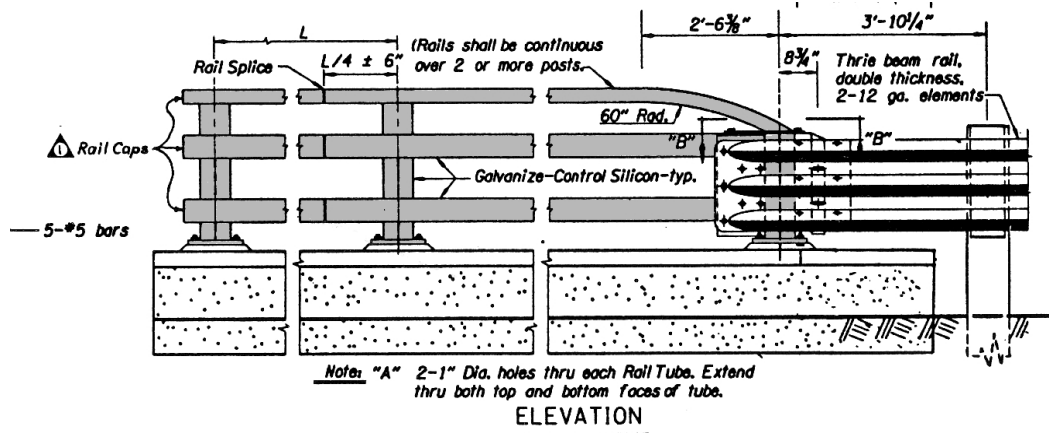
Standard 3-Tube Curb Mount Rail, Elevation
